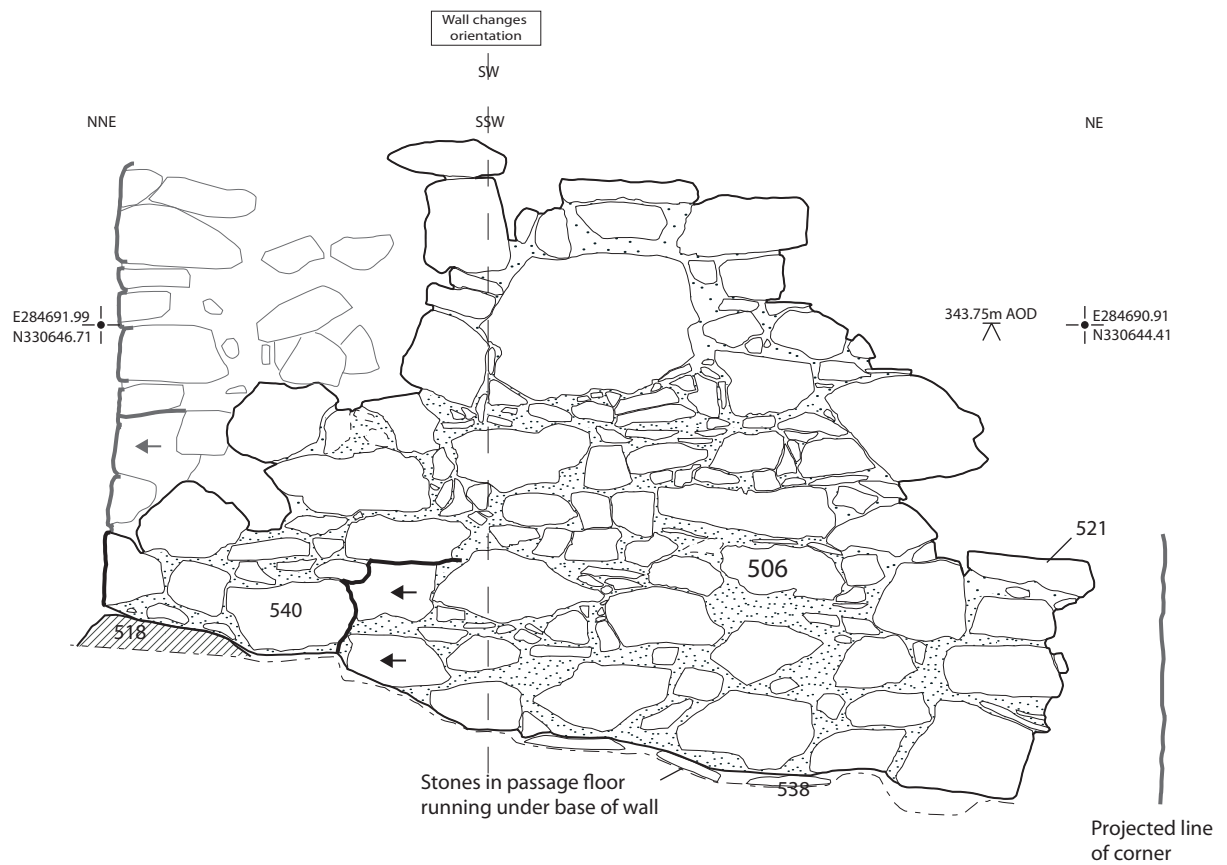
E side of entrance passage (506 and 540), W facing elevation
